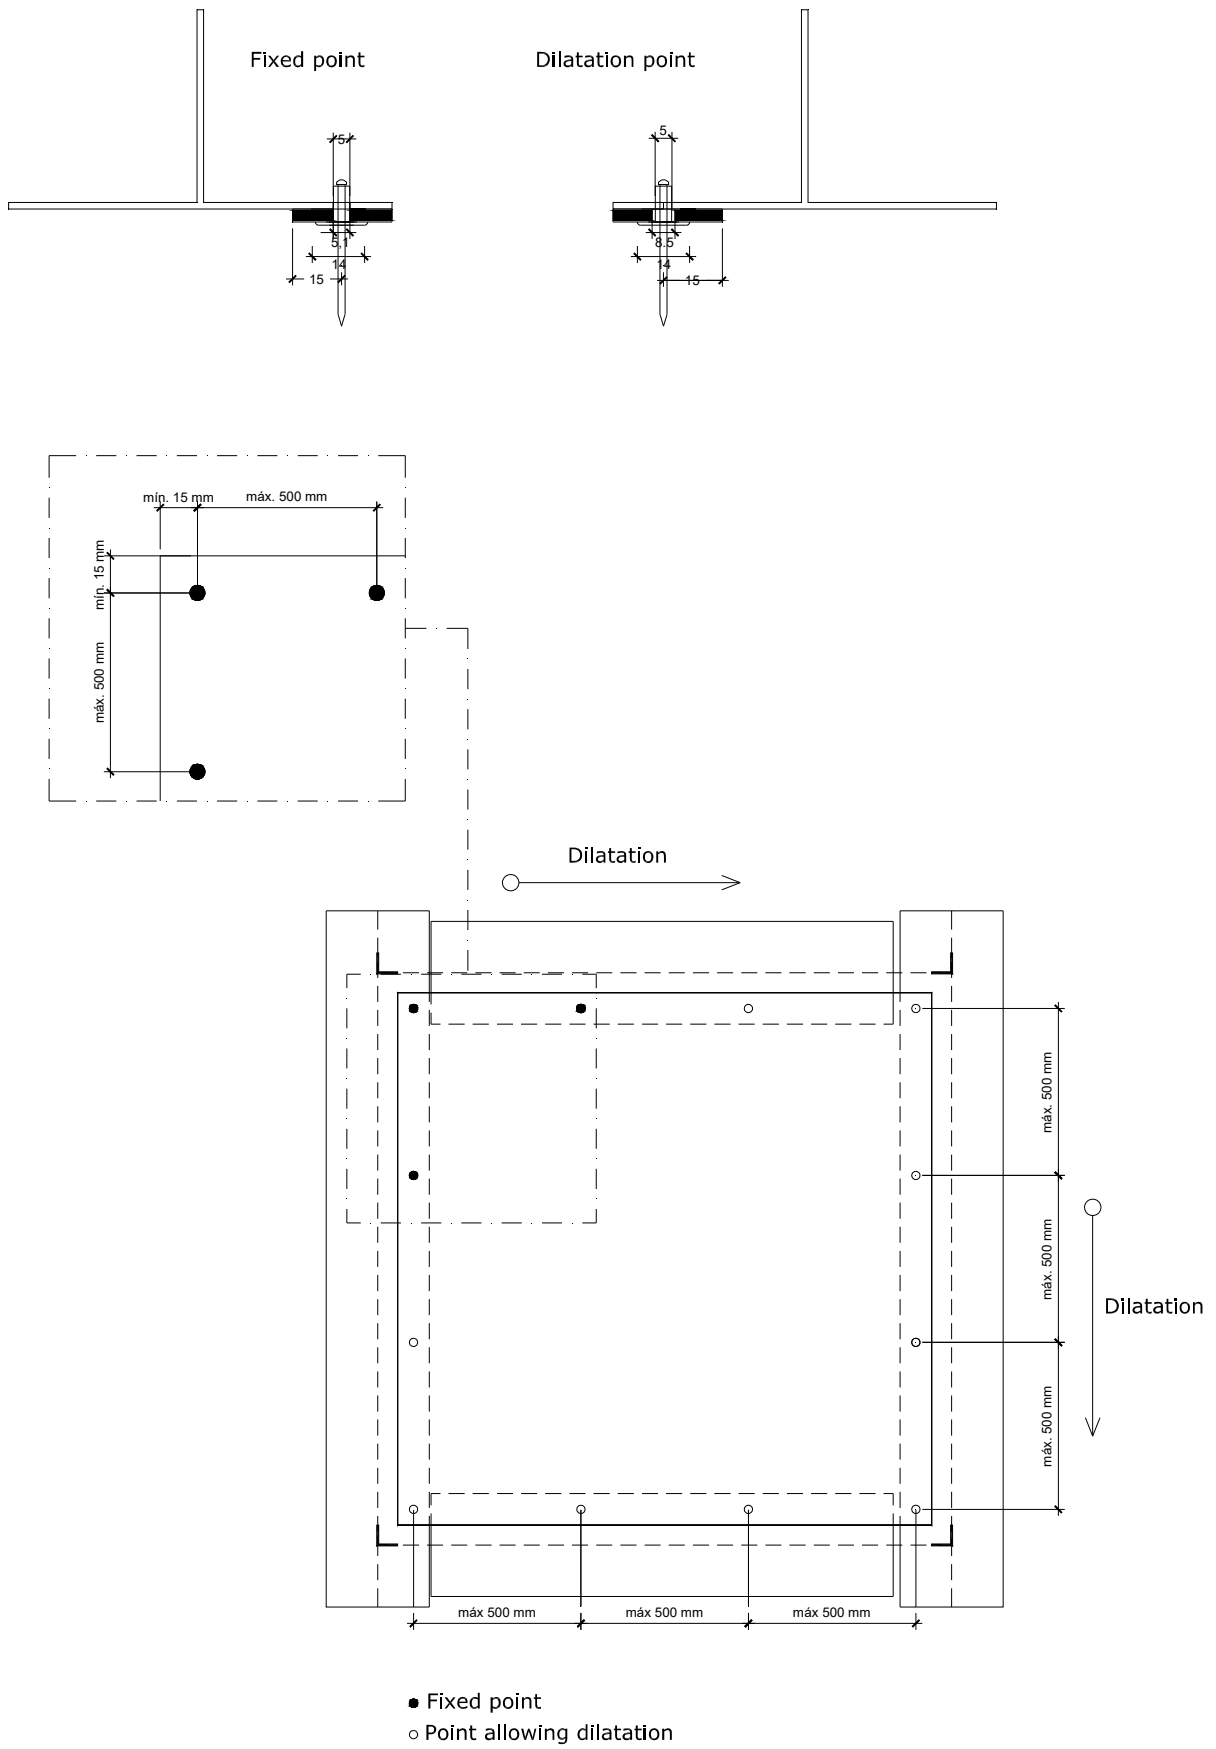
Details and example of riveting for etalbond® PE/FR Riveted Boards.
